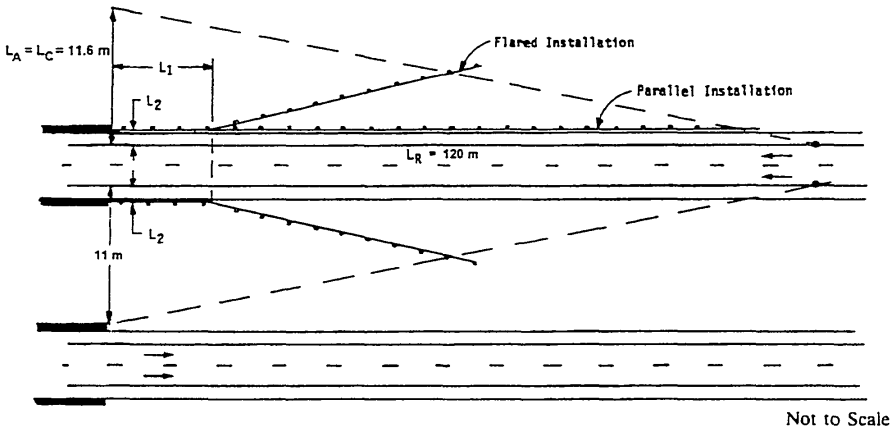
Example of Barrier Design for Bridge Approach
